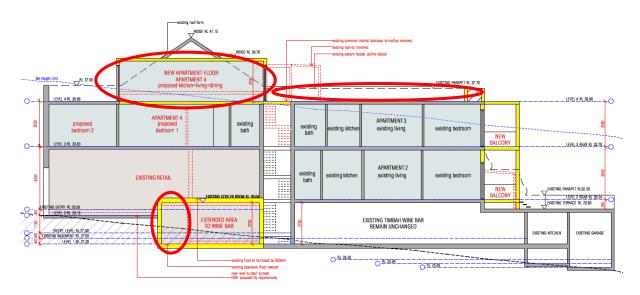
Extract of refused Section AA Plan (additional works that were proposed under D/2018/1586 that are not part of the subject application are circled in red)
